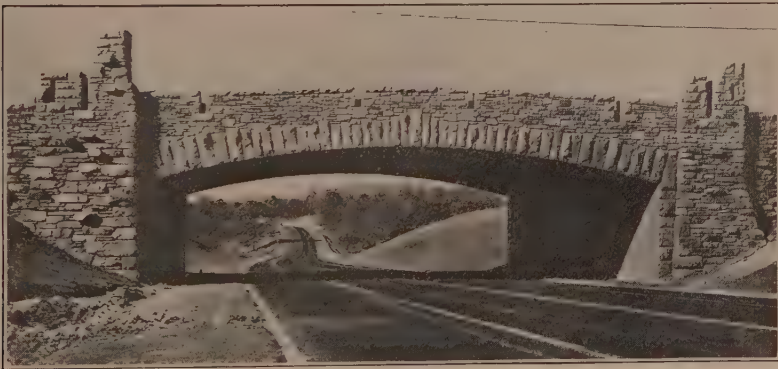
RIGID FRAME BRIDGE FACED WITH STONE
